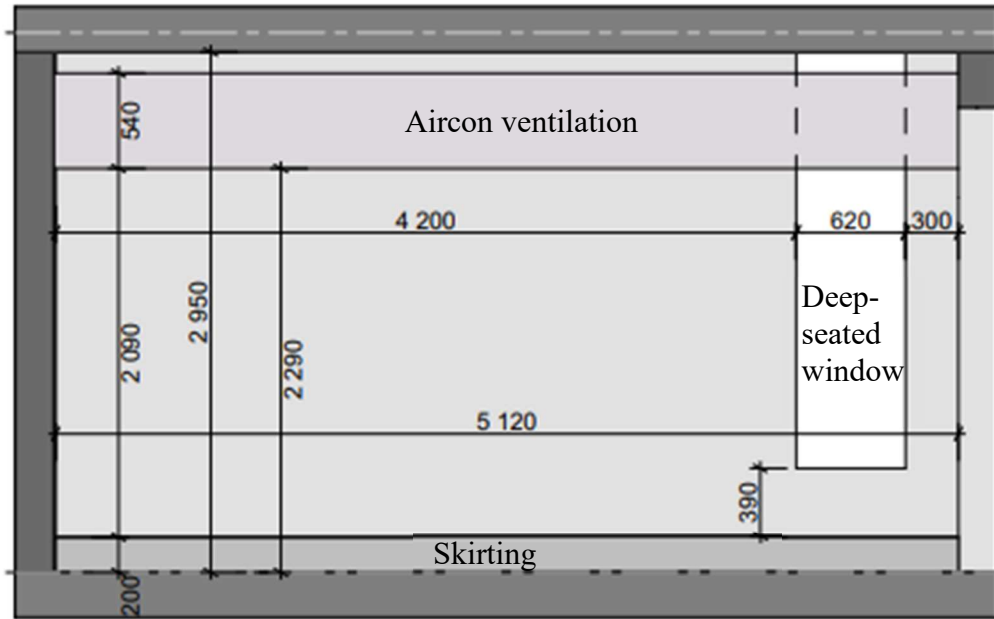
North wall elevation, Archicad. Scale 1:50. Elevation by Keaghan De La Mer.
